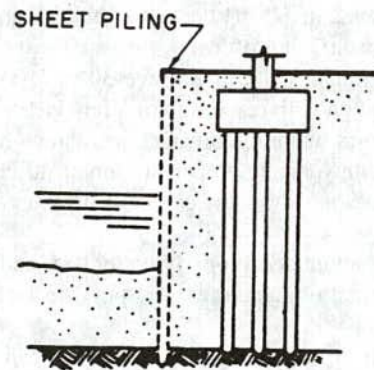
Foundation protection using steel sheet piling (10). (Courtesy: Louisiana DOT)
